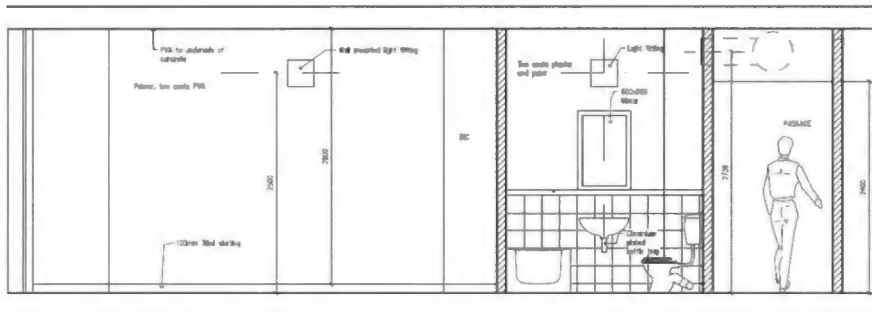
Detail side view layout of bathroom for Building A apartment units
